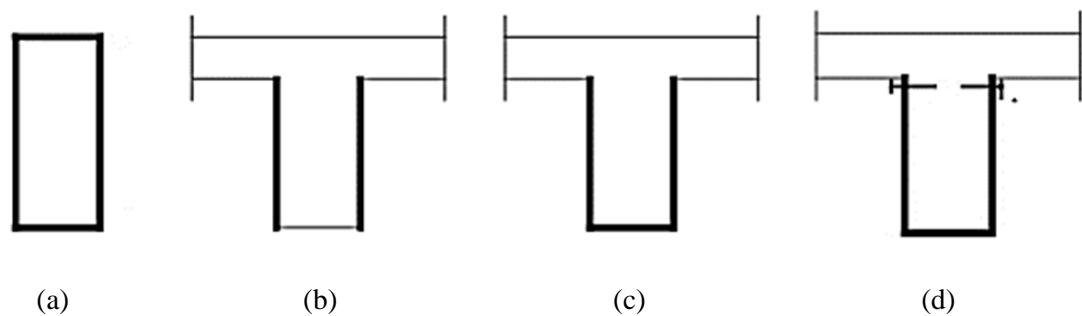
Typical configurations for externally bonded FRP sheet and strip strengthening:
